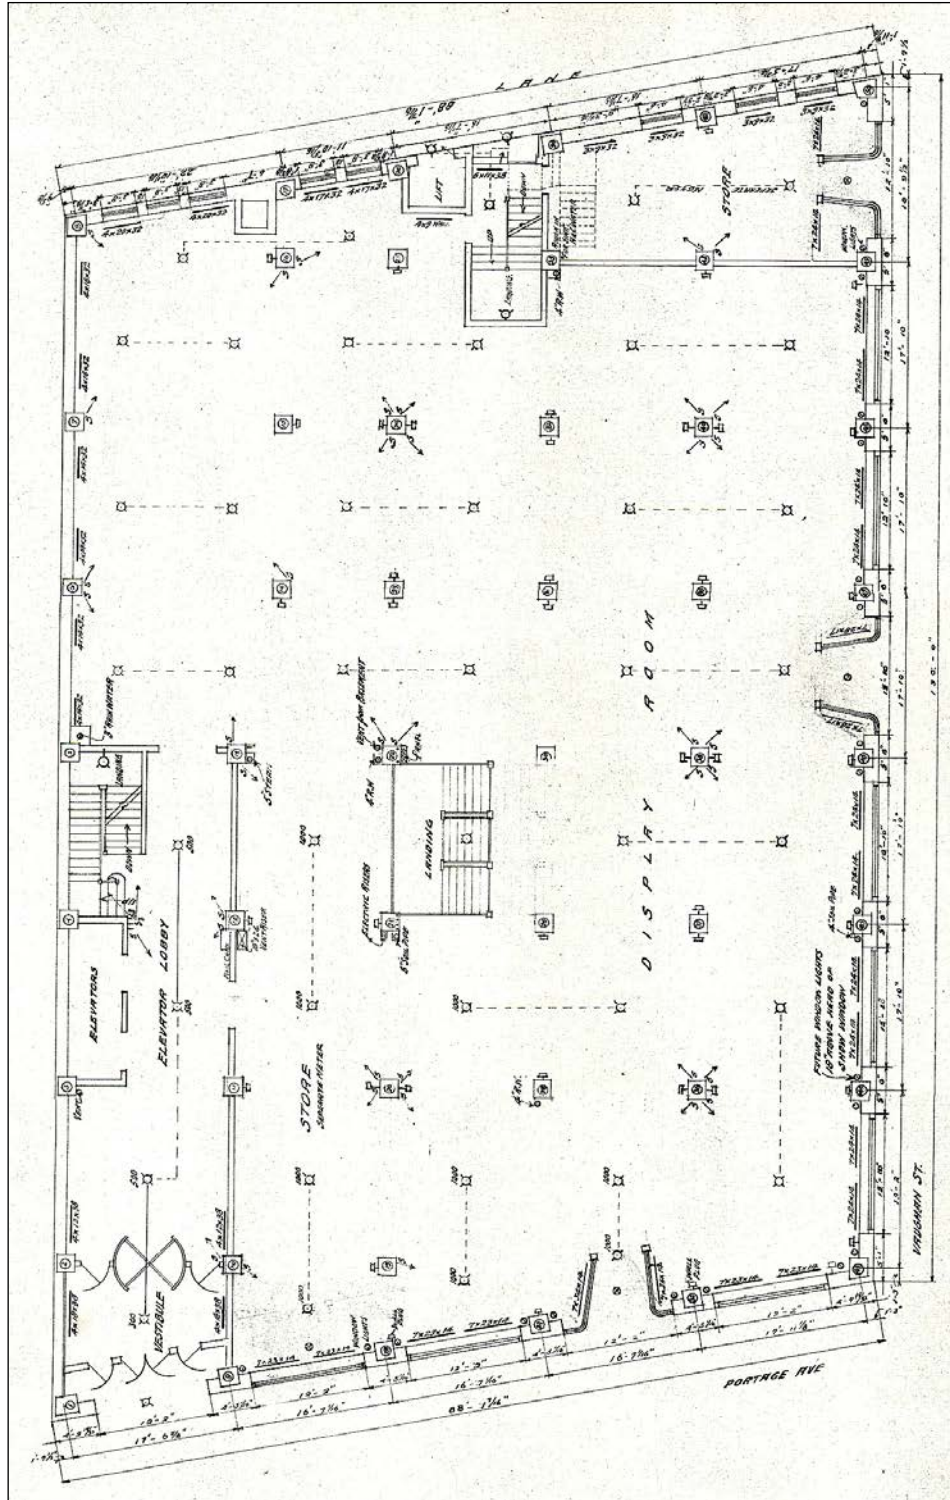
Architect’s plans, “Ground Floor,” Power Building, 428 Portage Avenue. (City of Winnipeg, Plan #4621/1928.)
